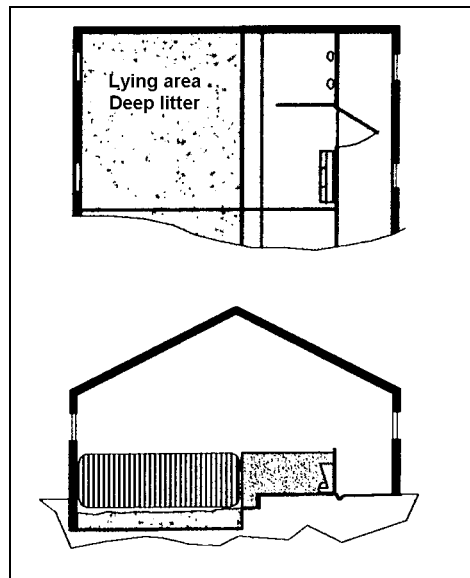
An example of a solid concrete floor system for growers-finishers [31, EAAP, 1998]
